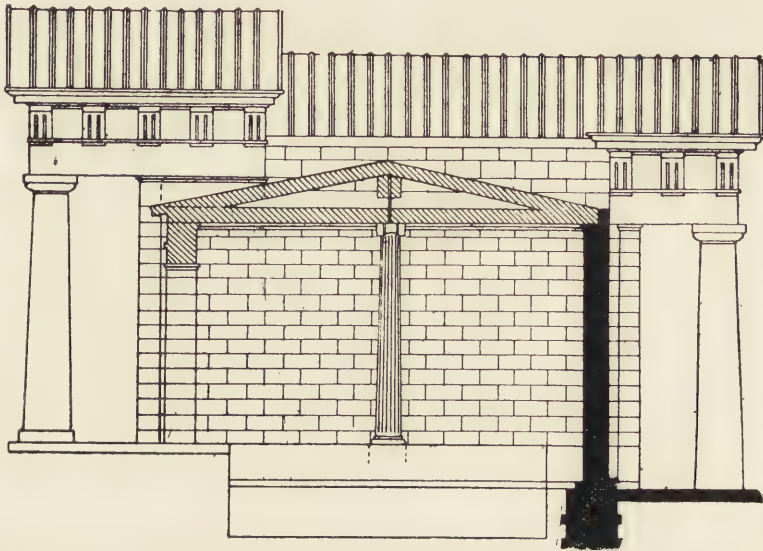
SECTION THROUGH NORTH-EAST HALL.
